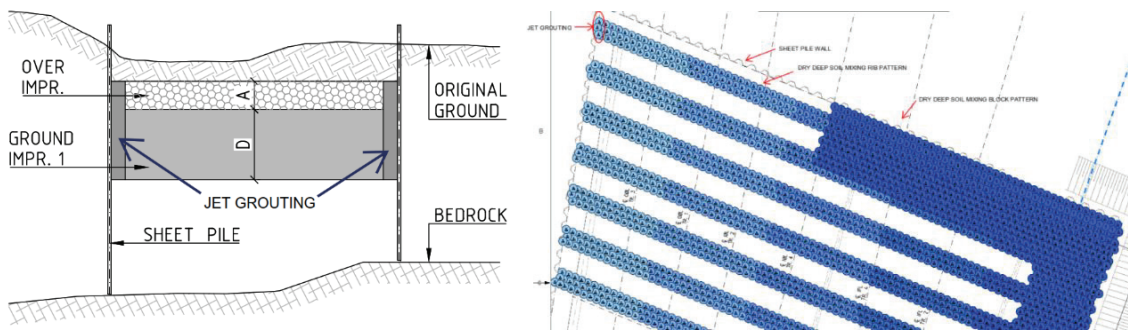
Joint Sealing for strutting slab by using Dry Deep Soil Mixing (LCC) and Jet Grouting
